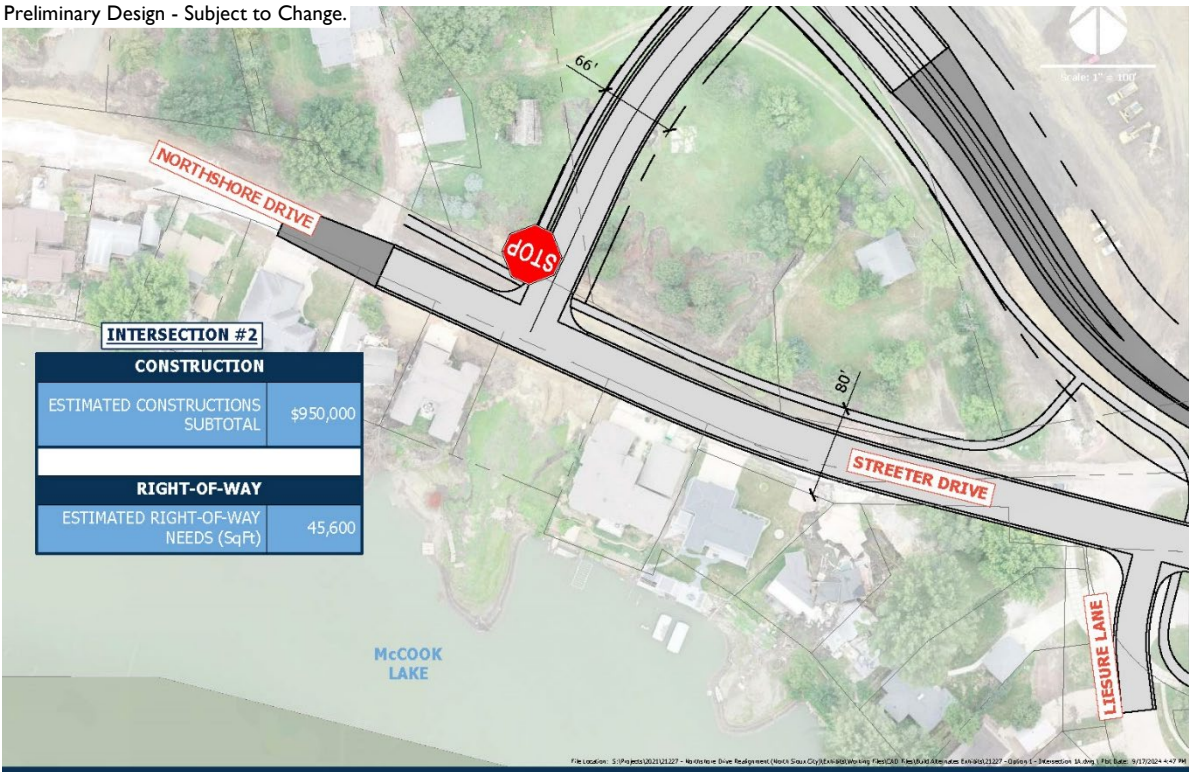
Build Alternative 1 and 2 - Intersection of New Connecting Roadway with New Bypass Roadway
